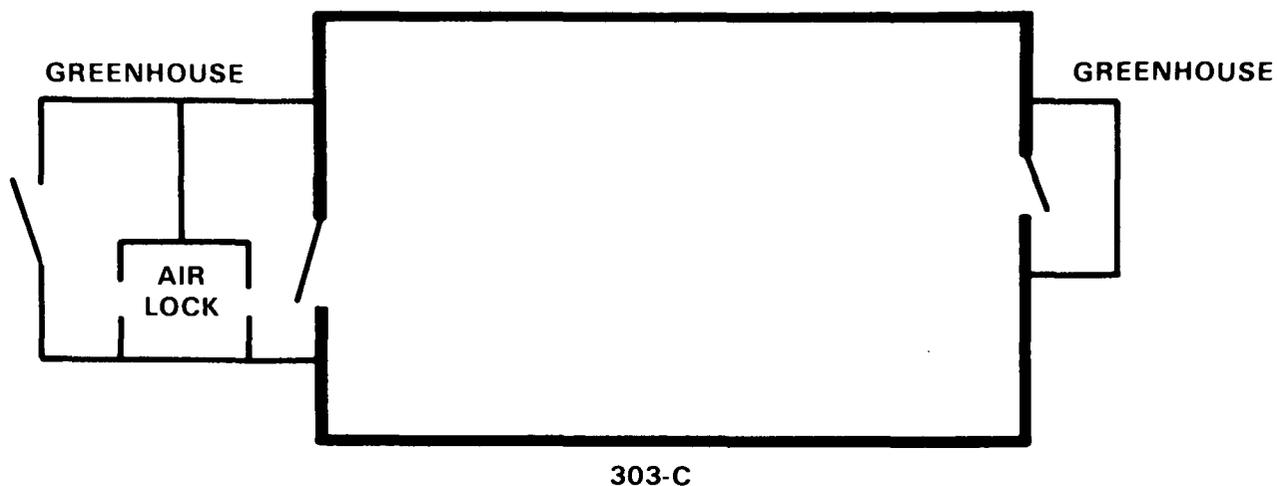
Greenhouse Construction for Decontamination Access to 303-C Building
